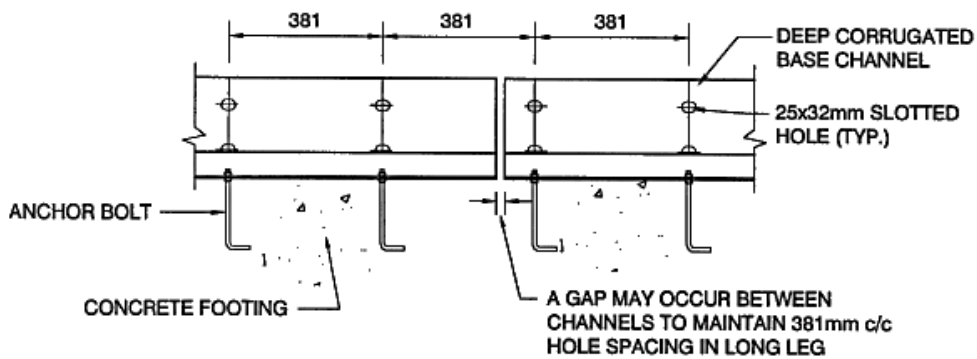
Deep Corrugated Structural Plate Type I plate configuration.^[6]
